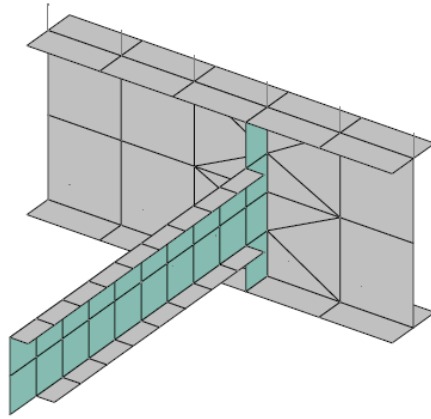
Illustration of diaphragm and girder modeling in STAAD.
